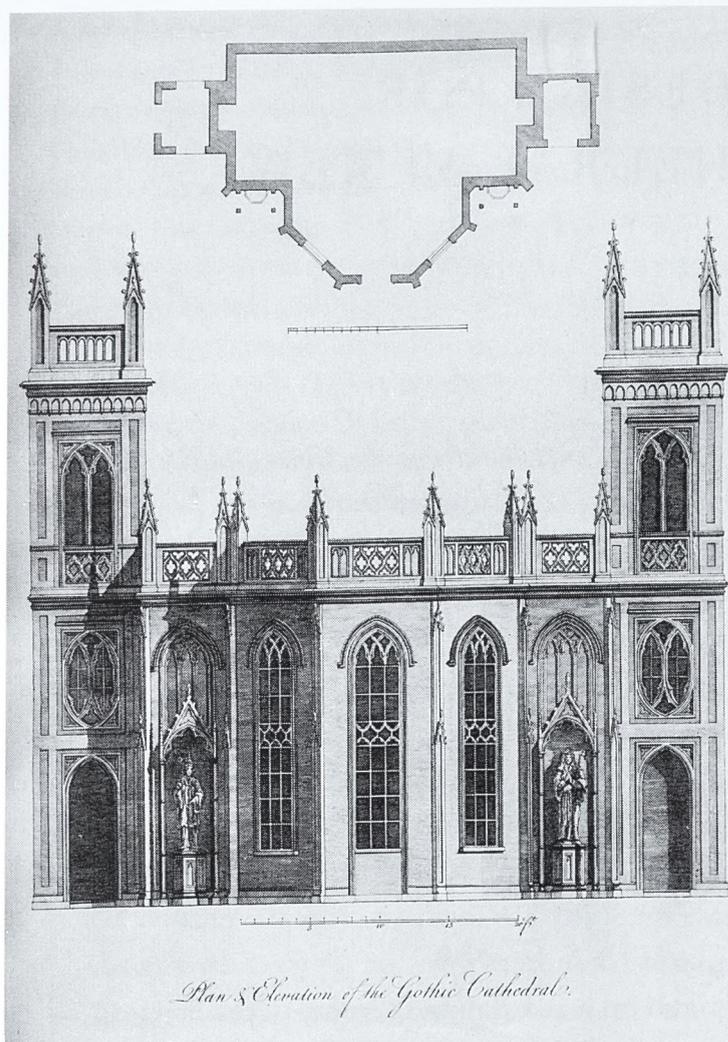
J. H. Muntz, Plan and elevation of the Gothic Cathedral, Kew Gardens, from Sir William Chambers, *Plans, Elevations, Sections and Perspective Views of the Garden and Buildings at Kew*, London, 1763.
